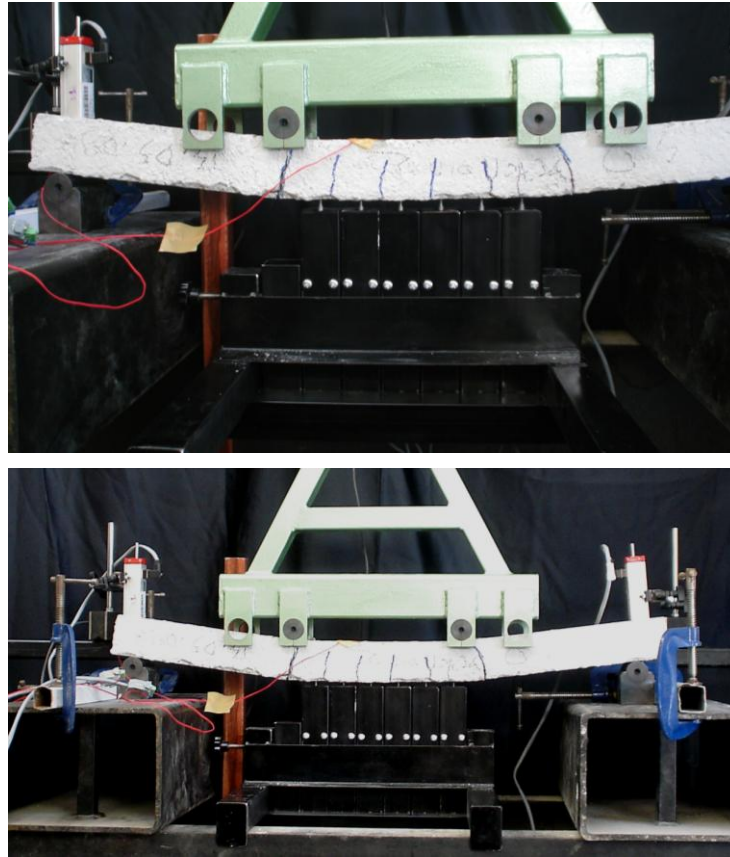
Cracking pattern of concrete with only bending reinforcement (*ws-rc*)
